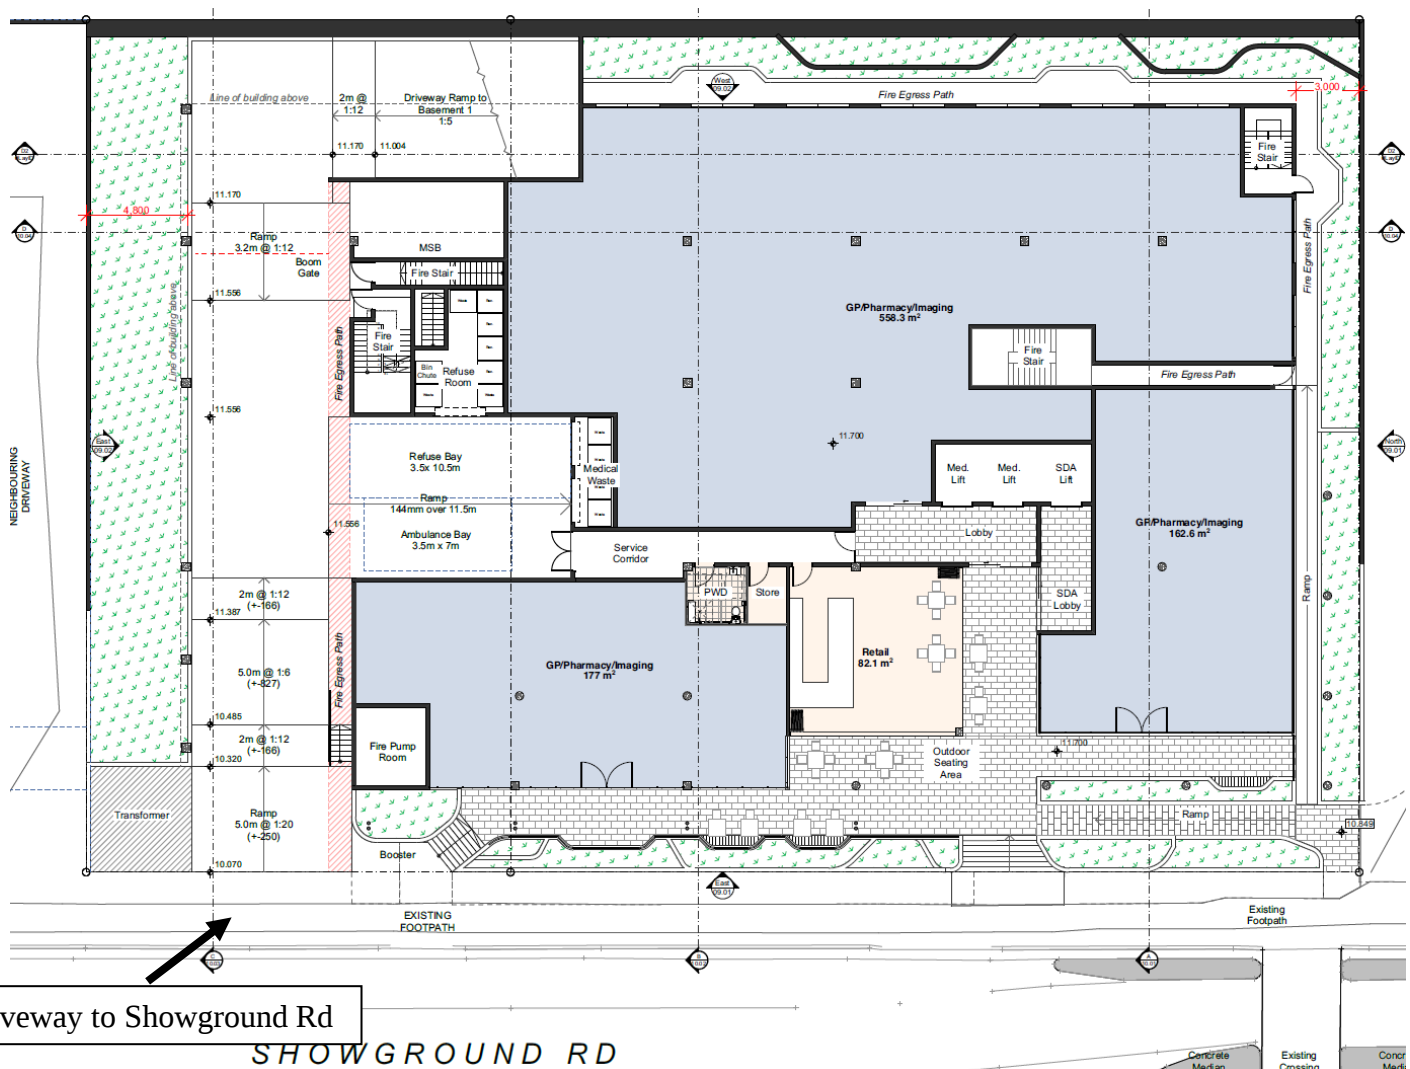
Proposed Medical Centre – Ground Floor Site Layout and Driveway
